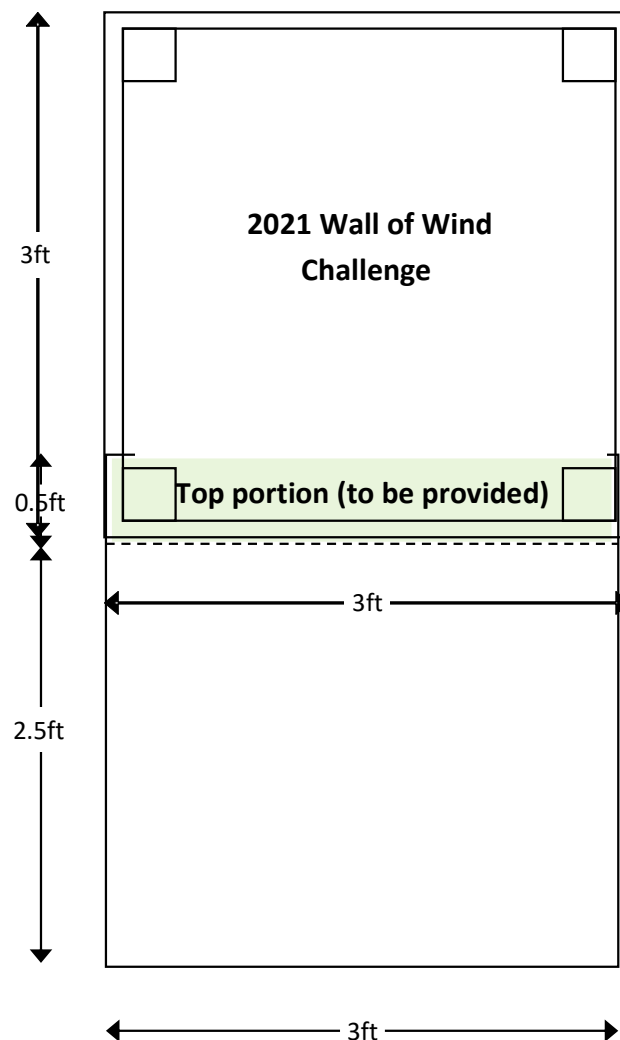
Top and side views of the test cube representing a building with a flat roof.
